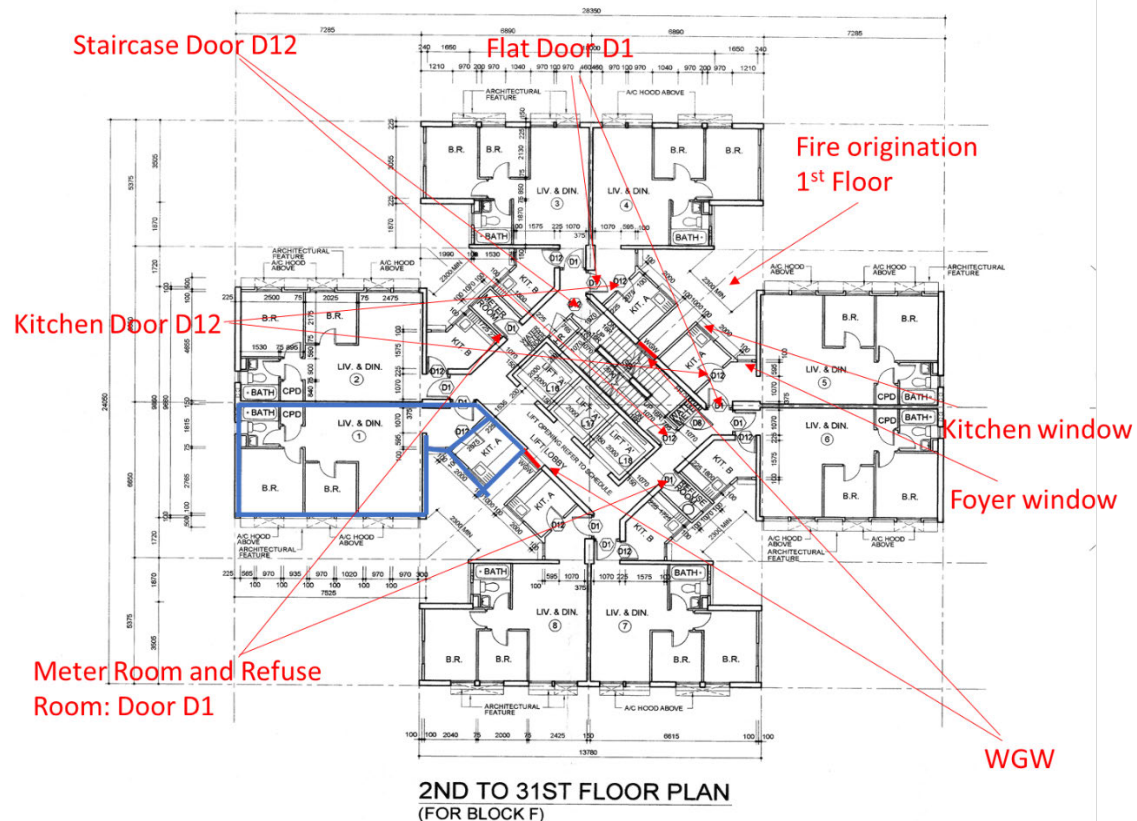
Wang Cheong House Floor Plan, as-built drawing
